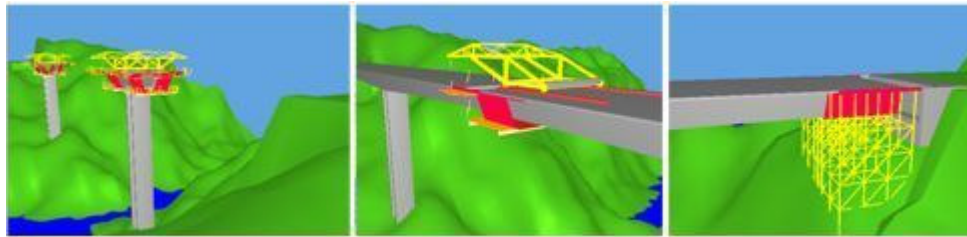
Movement of the advanced equipment and concreting near the abutment.
